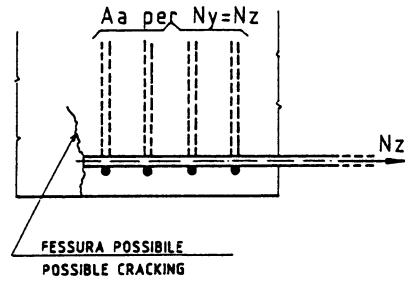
Anchorage of a bar: necessity of transverse reinforcement.
